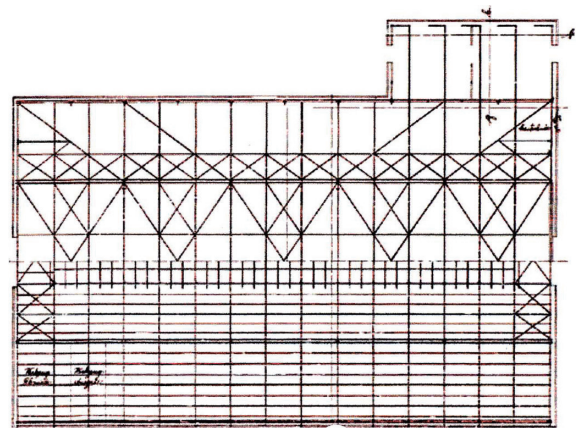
Roofing framing plan of Repair Shop⁵⁾
